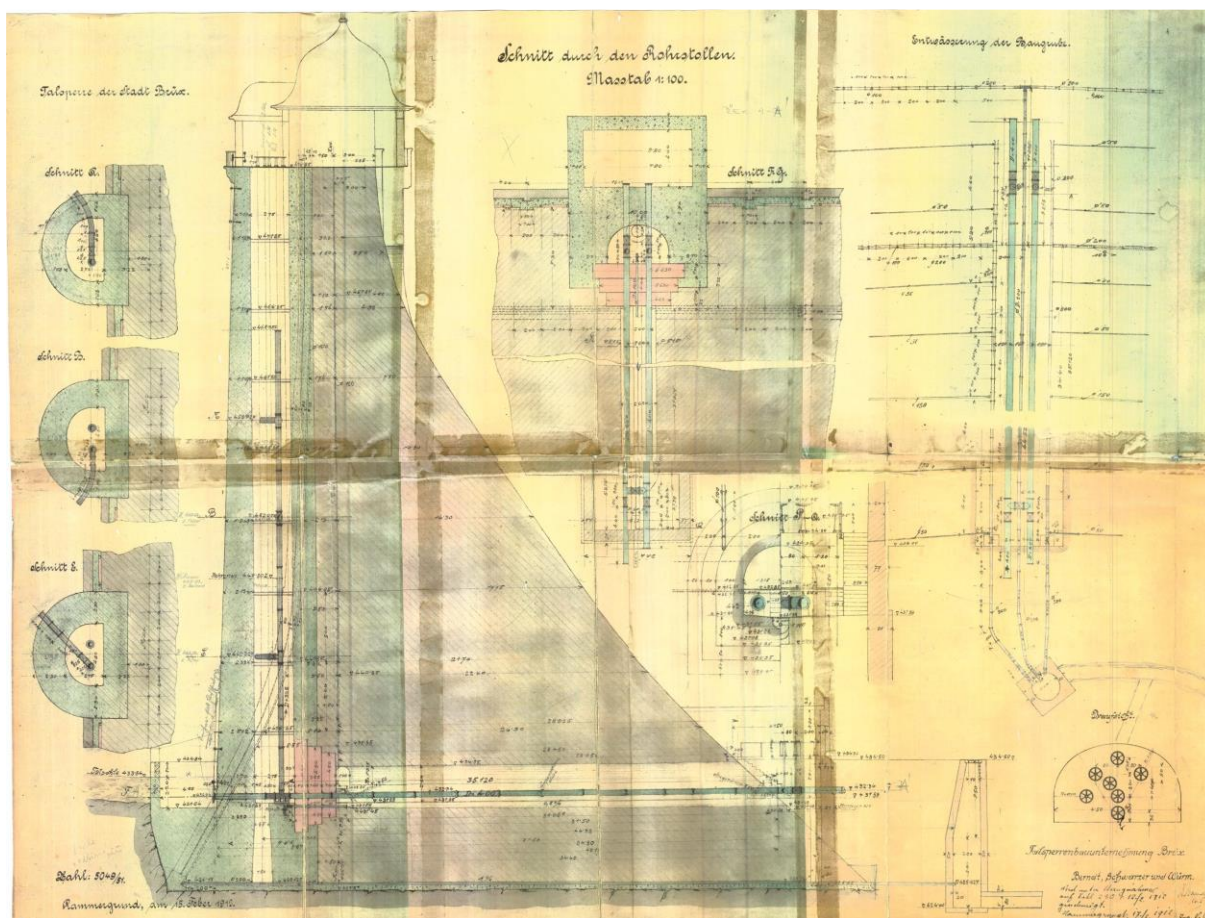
Plan of the original sectional view of the dam, 1911, © Jan Vojtěchovský et al., 2018.
